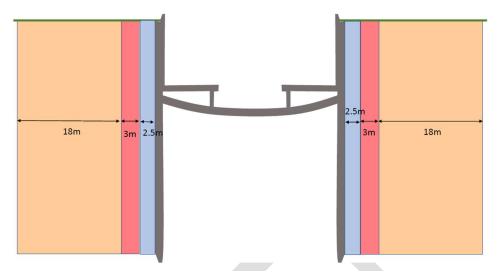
Retained-Cut Section Protection and Exclusion Zones
